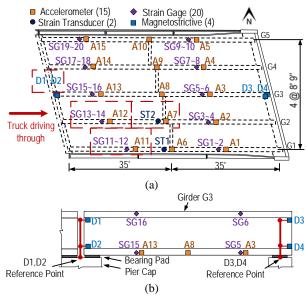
Instrumentation: (a) instrumentation plan, (b) elevation view of girder G3
